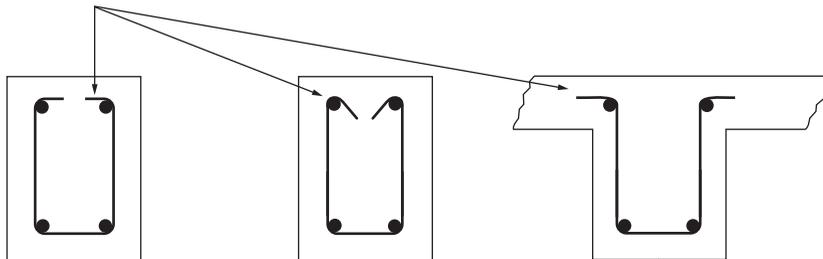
Stirrup detailing requirements. (Source: Wang and Salmon, 1985.)
